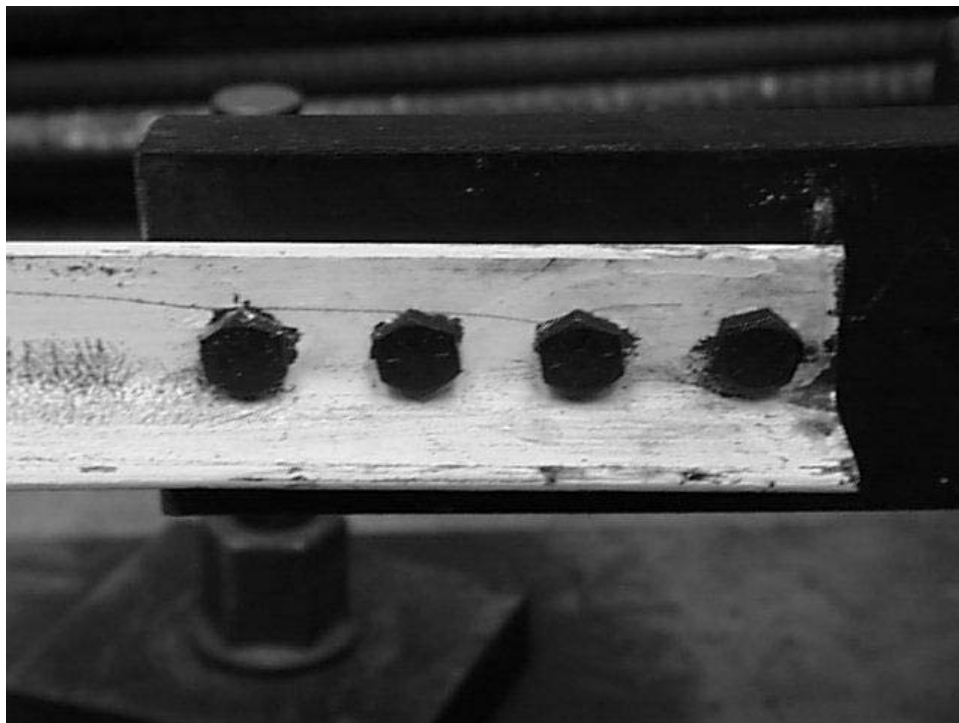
Single angle with unreinforced bolted connection to gusset plate
